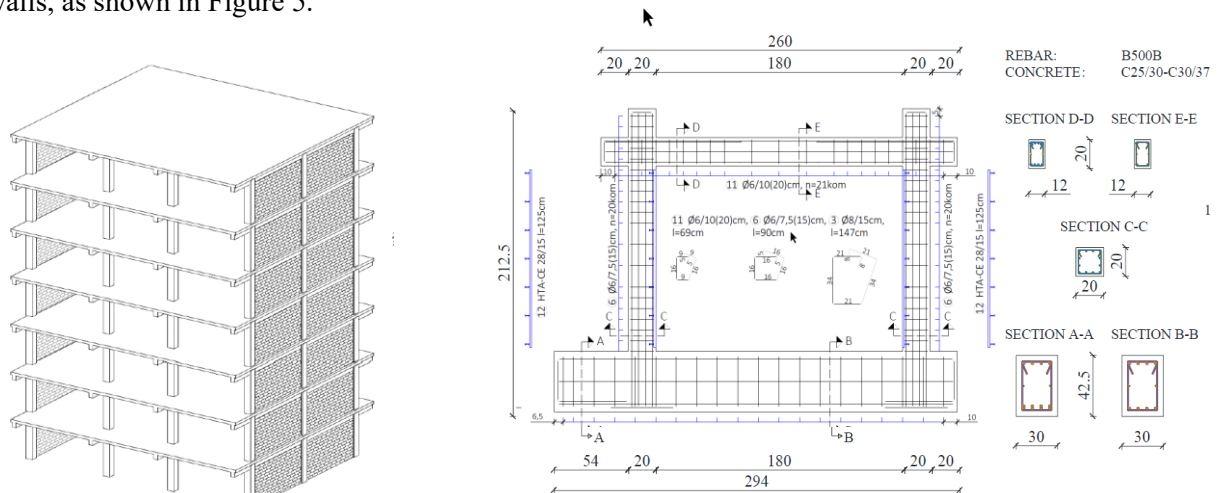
a and b, Representative Building with RC frames, and test frame used for macro scale tests.
